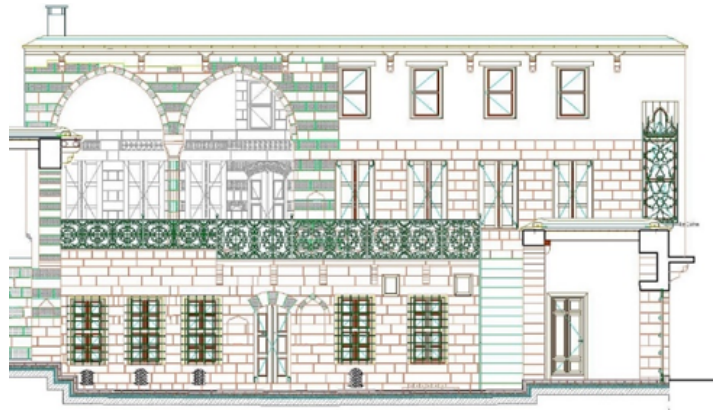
Analytical survey of the south façade of the building facing the courtyard
